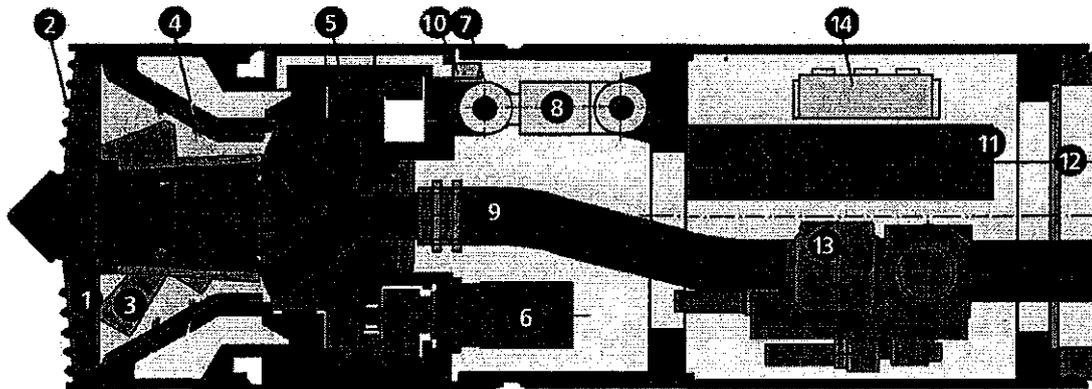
Layout of a conventional Herrenknecht AVN-machine.
